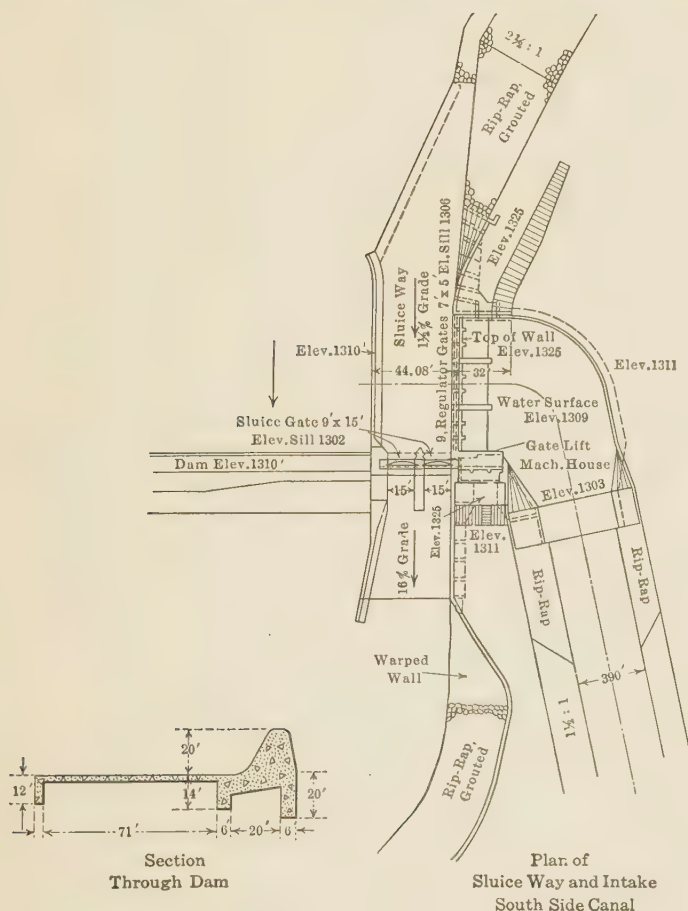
Scouring sluices at Granite Reef dam. Salt River Project, Ariz.
